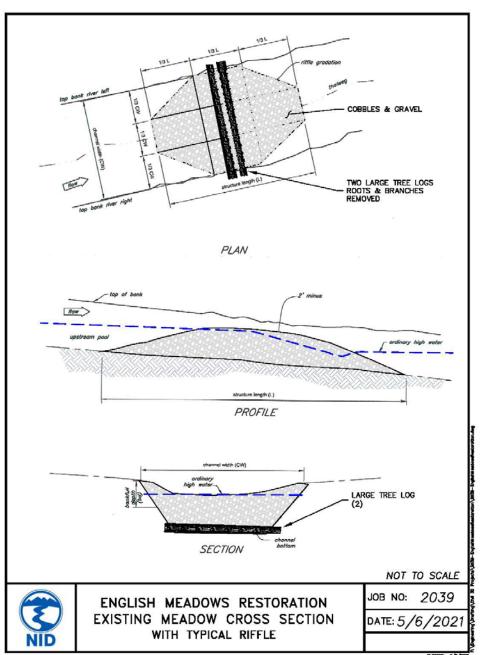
Existing Meadow Cross-Section with Typical Riffle.
